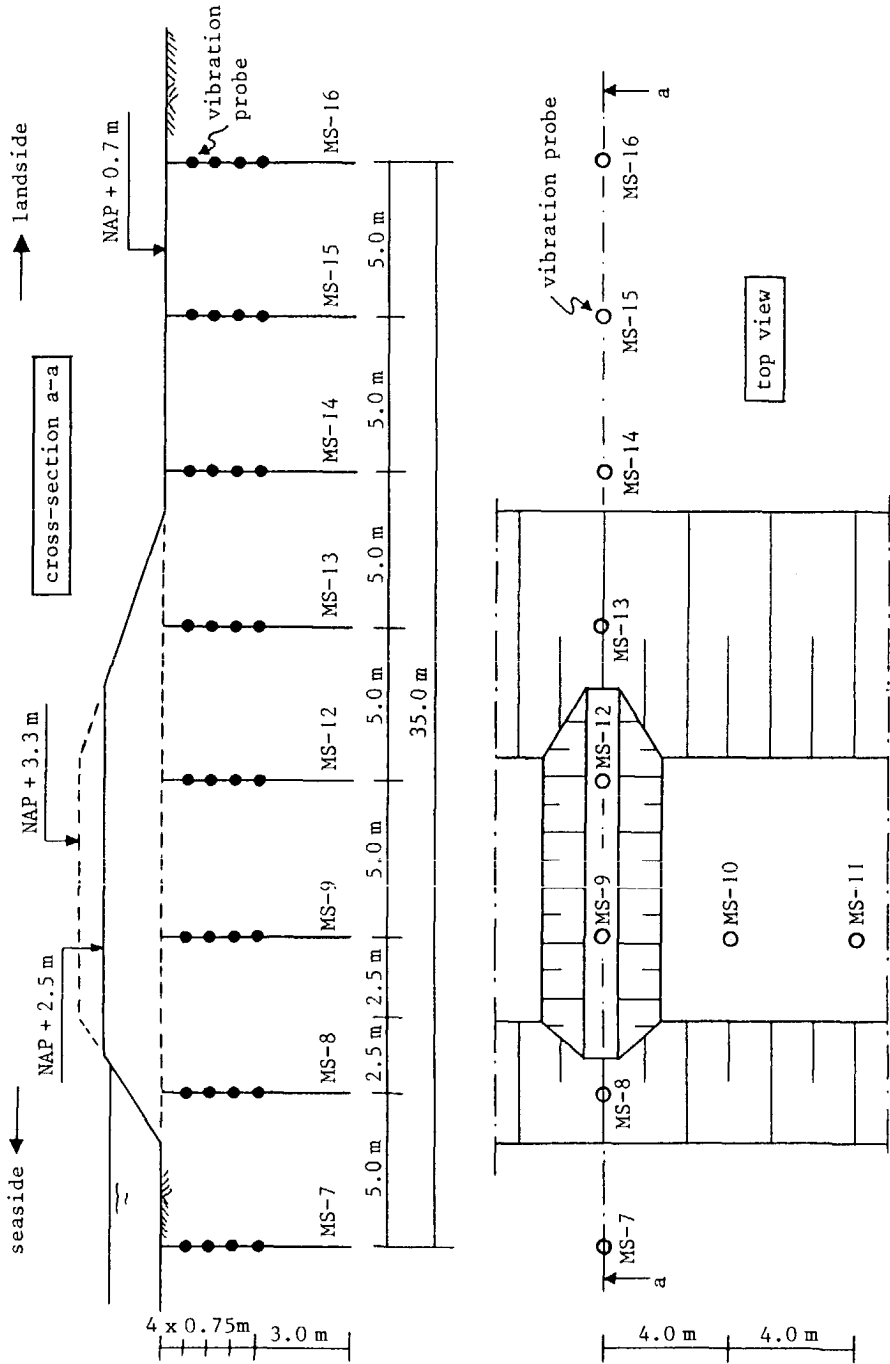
Cross-section and plan view of sand-dam with positions of vibration probes.
